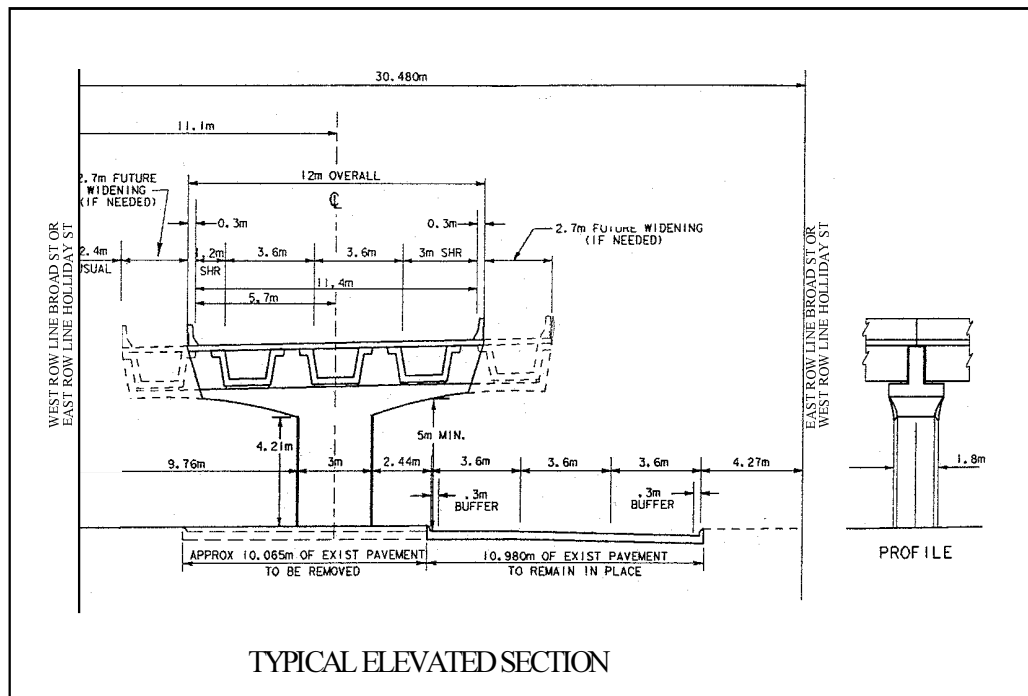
Future elevated highway built on existing roadway. This figure shows a single-column bent option with the possibility for future widening.
